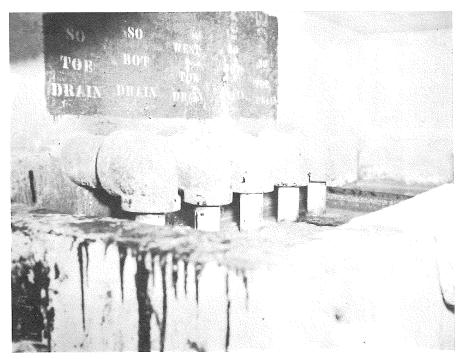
Drains at west end of drainage inspection chamber, January 10, 1952. Note evidence of asphalt discharge.
